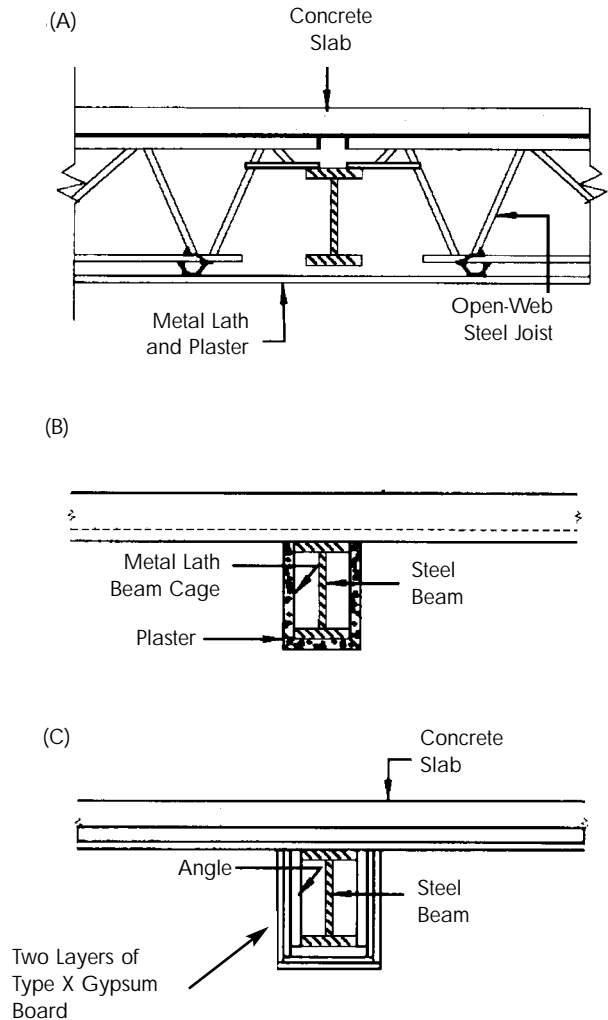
Some methods for applying gypsum as fire protection for structural steel: (a) open-web joist with plaster ceiling; (b) beam enclosed in a plaster cage; (c) beam boxed with wallboard. Illustration courtesy of the Gypsum Association, *Fire Resistance Design Manual*.
